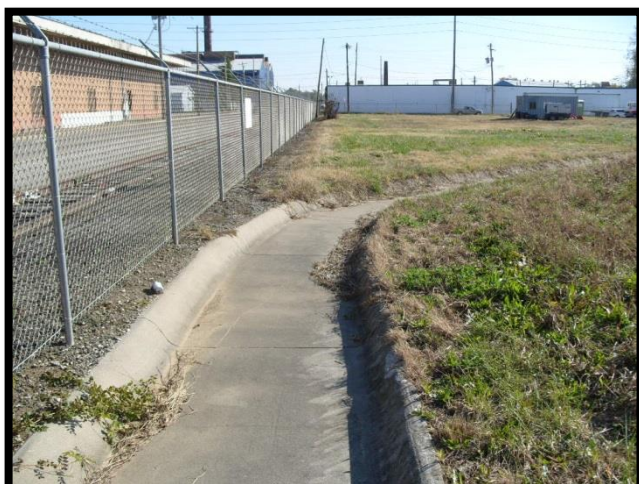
Concrete drainage swale, south side of Taracorp pile (view north).
